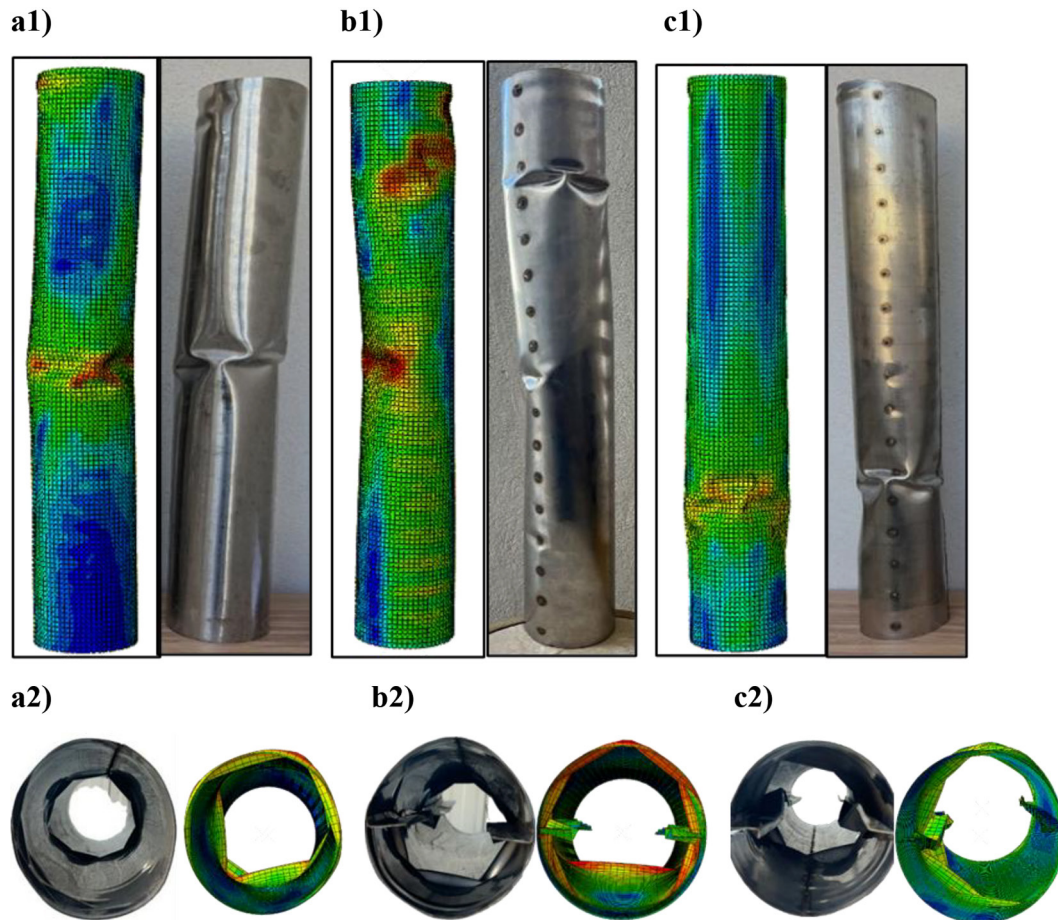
Comparison of buckling behaviors obtained from experimental tests and numerical simulations: a1–a2) column without stiffeners; b1–b2) column with two I-shaped stiffeners; c1–c2) column with two L-shaped stiffeners
